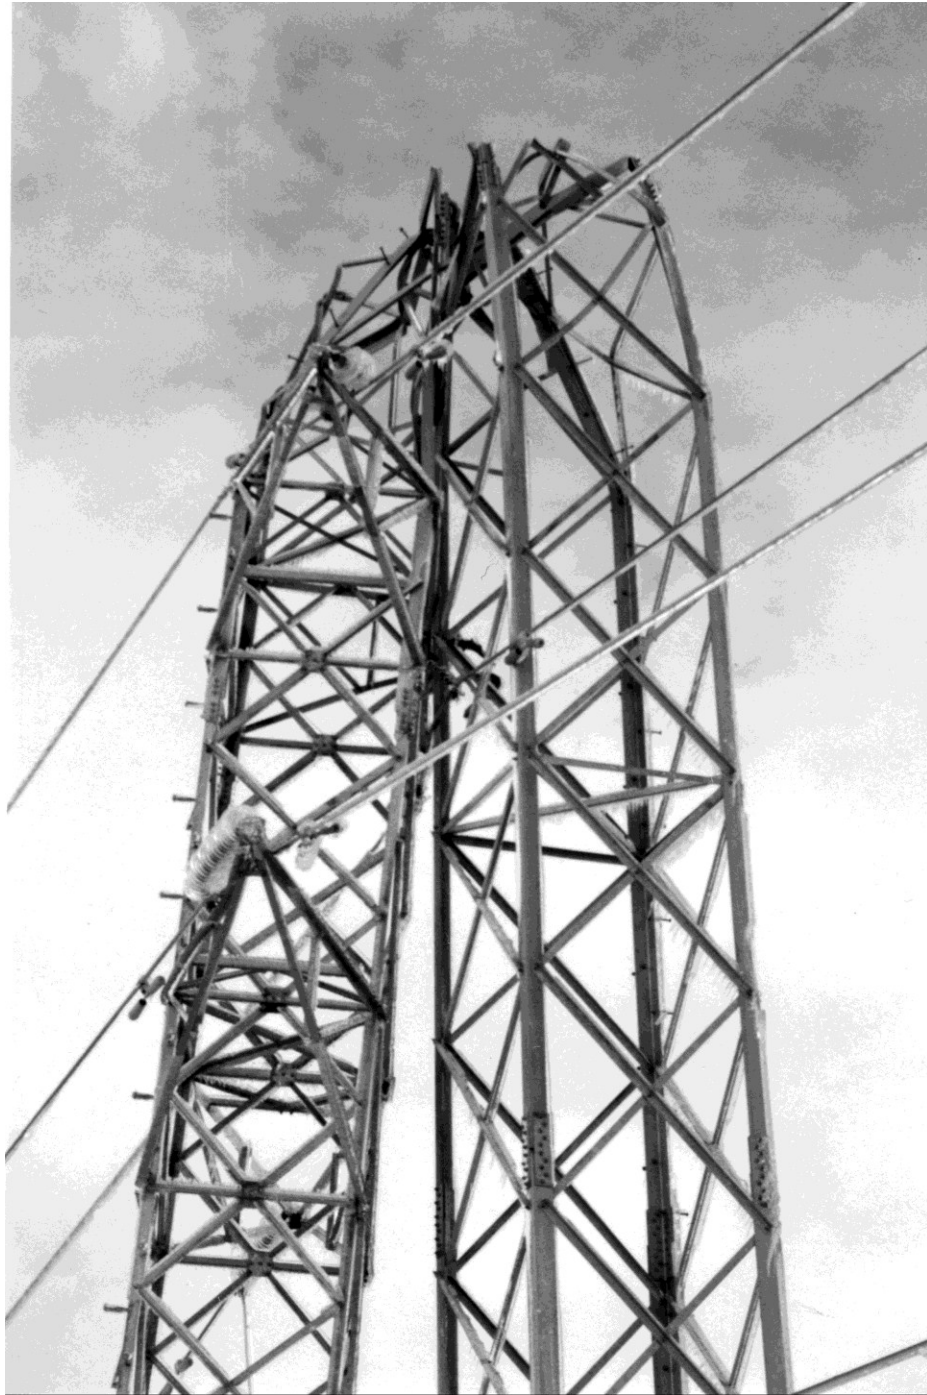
Close-up view of damage at suspension tower#4 (Source: Hydro-Québec)
